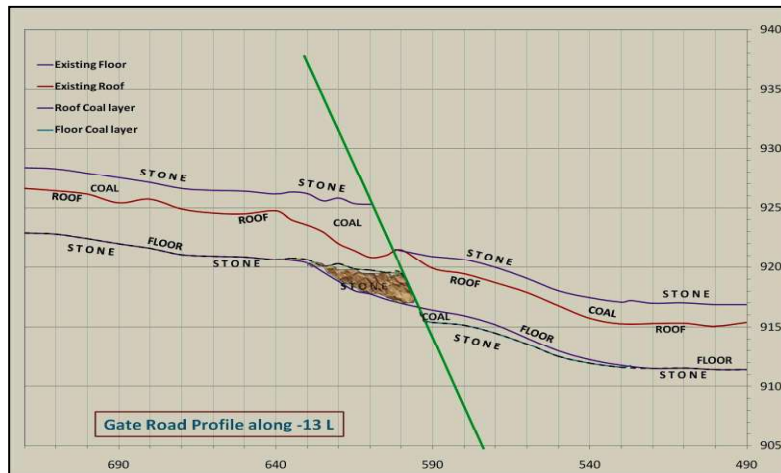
Gate Road (Section A-A of Fig.4) and Stone Excavation during Development (-13L main gate)
